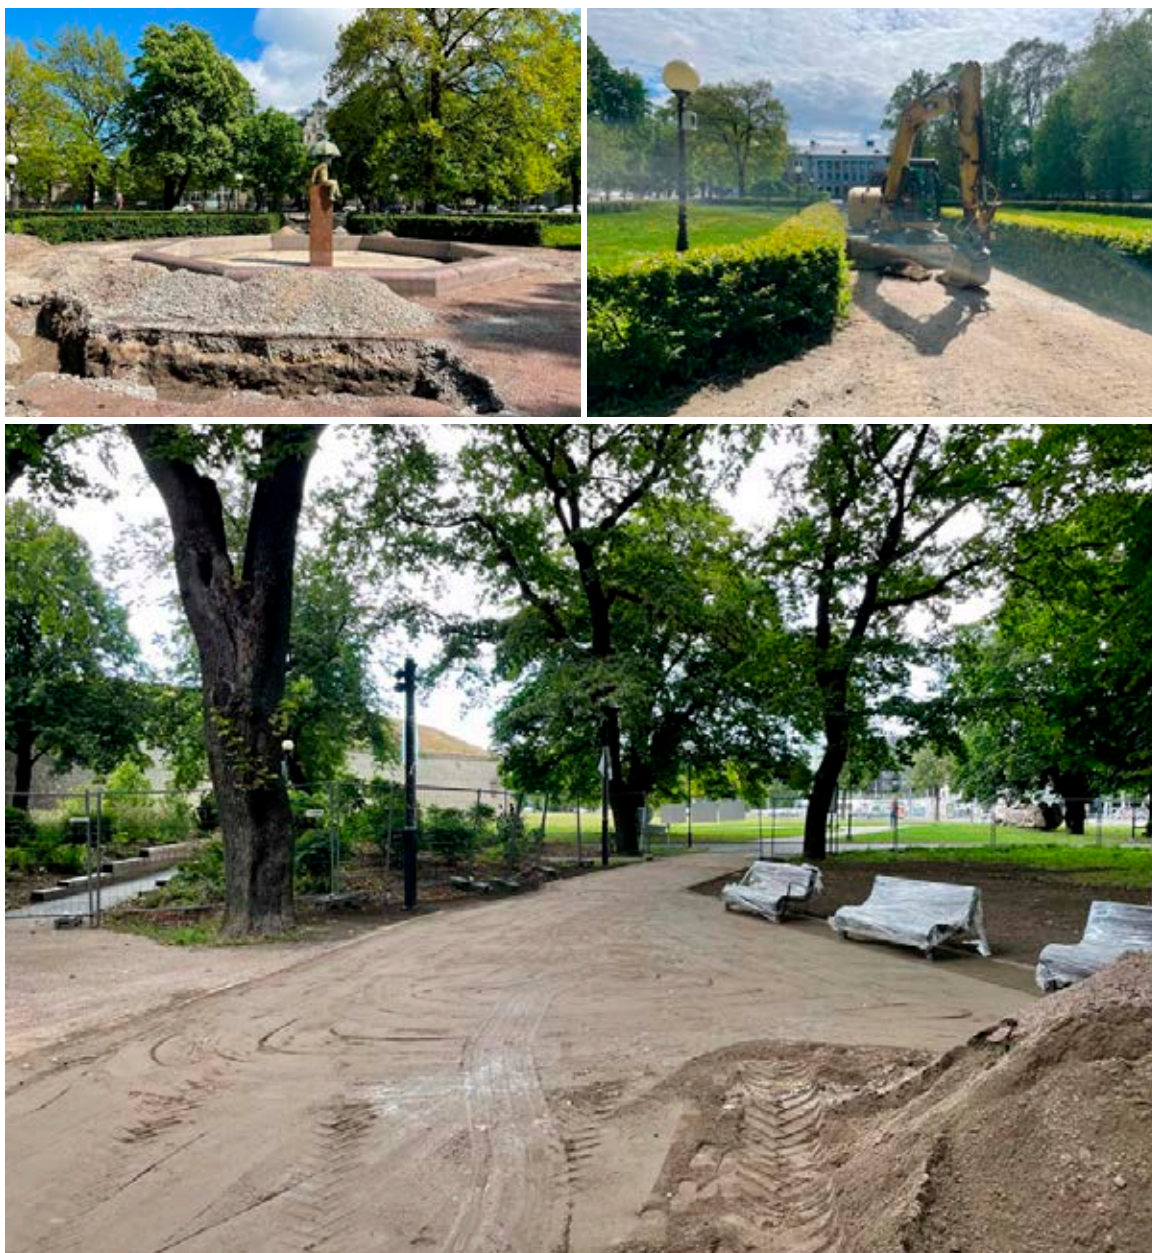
Construction works at the LUCIA pilot site in Tallinn (all photos provided by Tallinn City Government).
